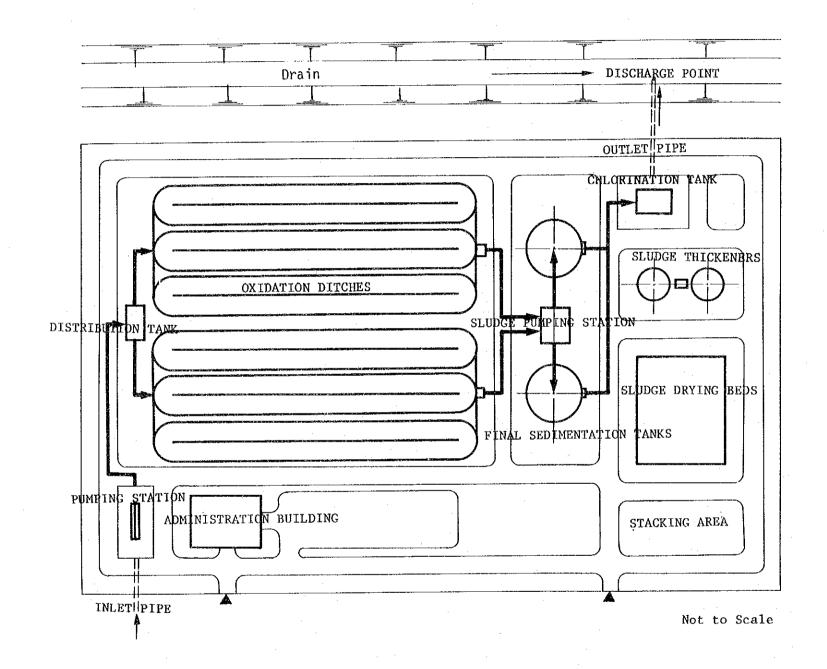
<u>Sewage Treatment Plant Layout Plan</u>
